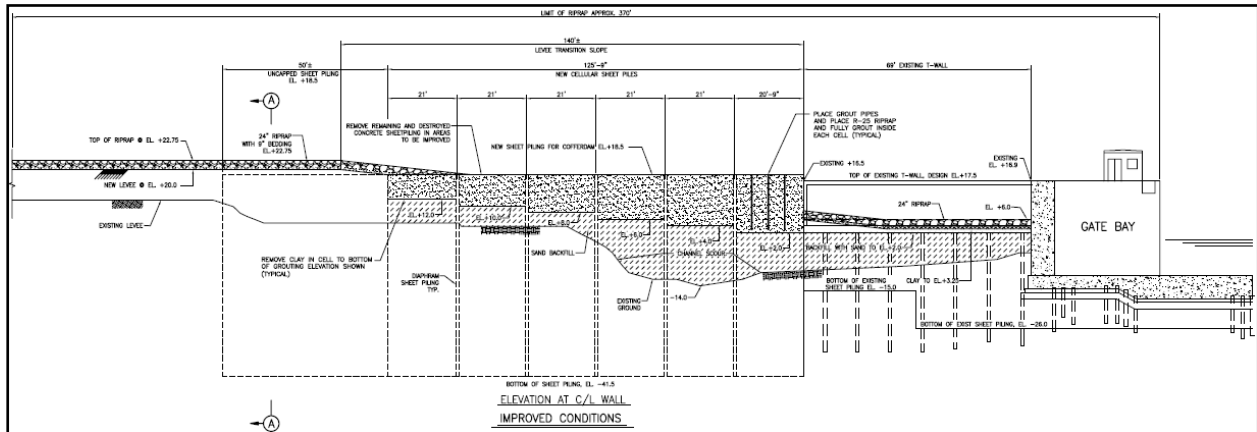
New sheetpile diaphragm wall replacing failed uncapped I-wall at Bayou Bienvenue Control Structure. (Note: This is same repair being done for northwest wall at Bayou Dupree)
